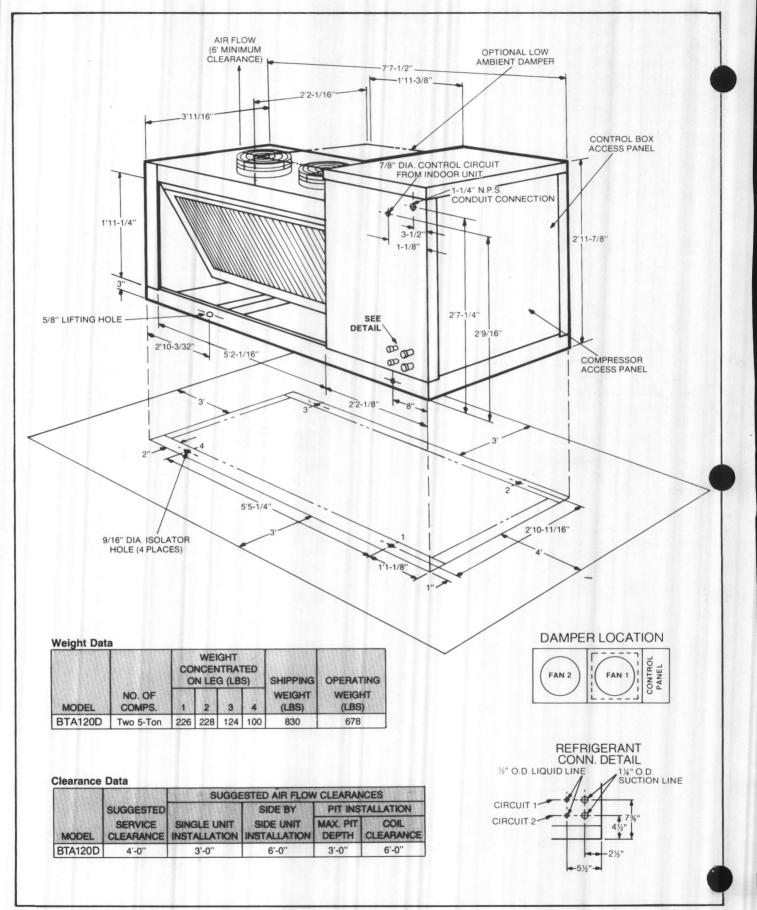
Dimensions, Weights, and Clearances for BTA120D Units
